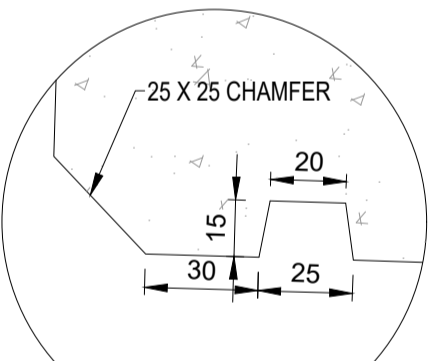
ELEVATION ON BOX VERTICAL/TRANSVERSE JOINT
